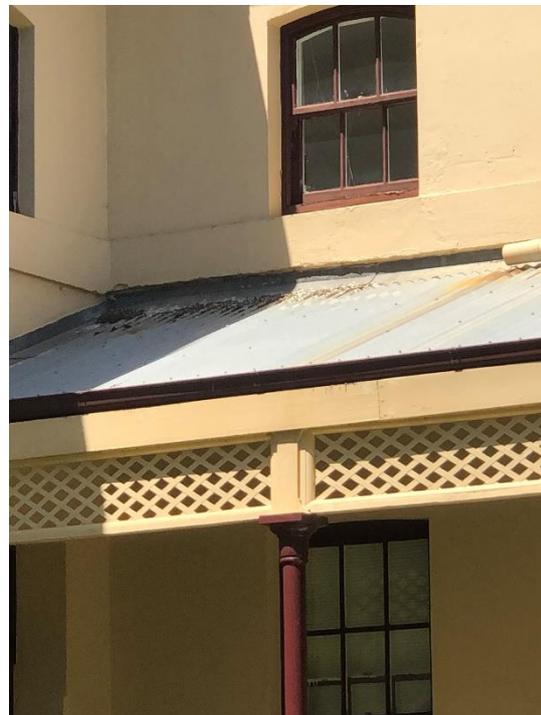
Bird fouling to West verandah roof outside unit 19 (Central wing)
